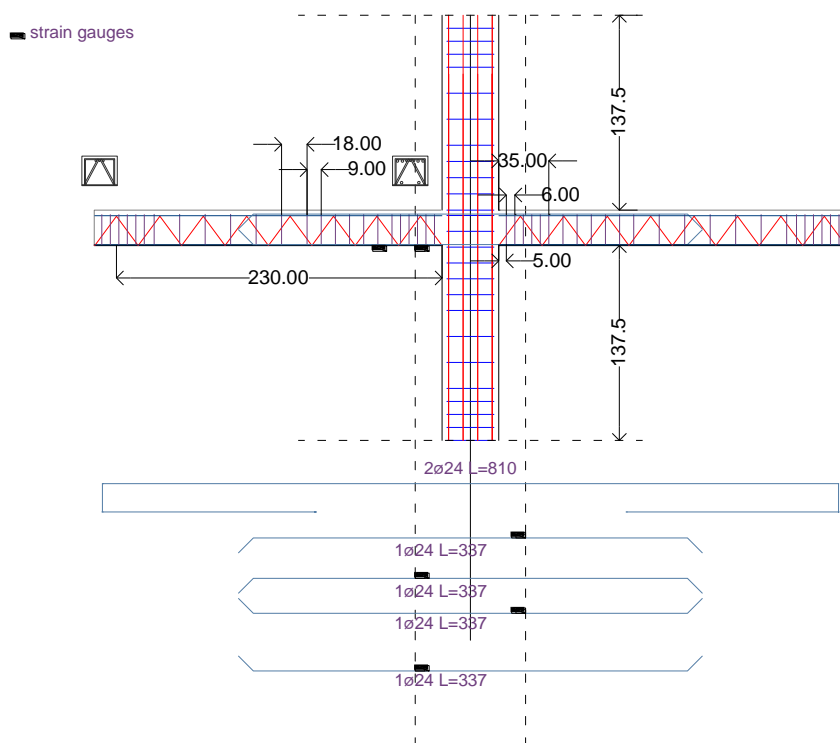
and 7.10b show the longitudinal and cross-sections of the column with the layout of the reinforcement.
